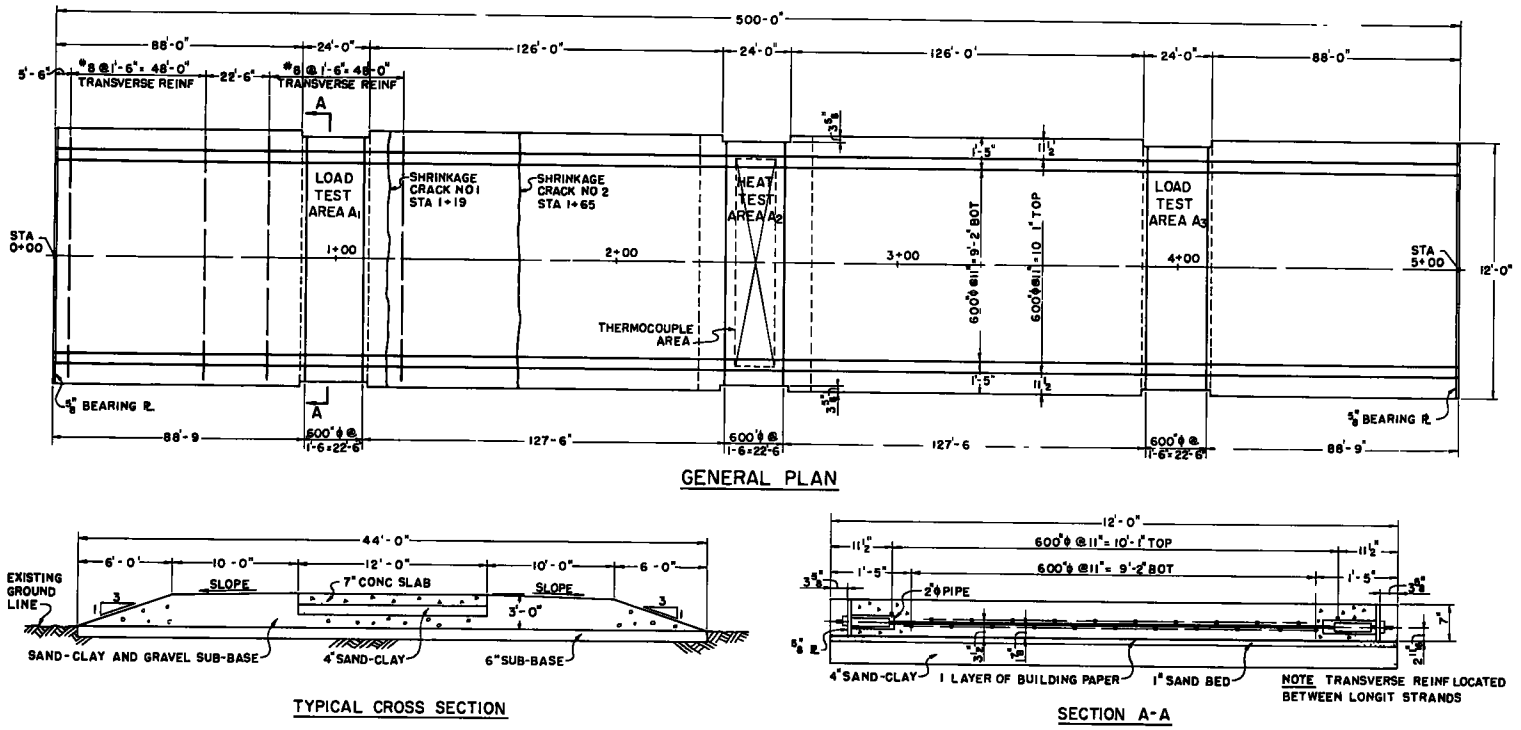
General plan (drawing — courtesy of American Concrete Institute).
